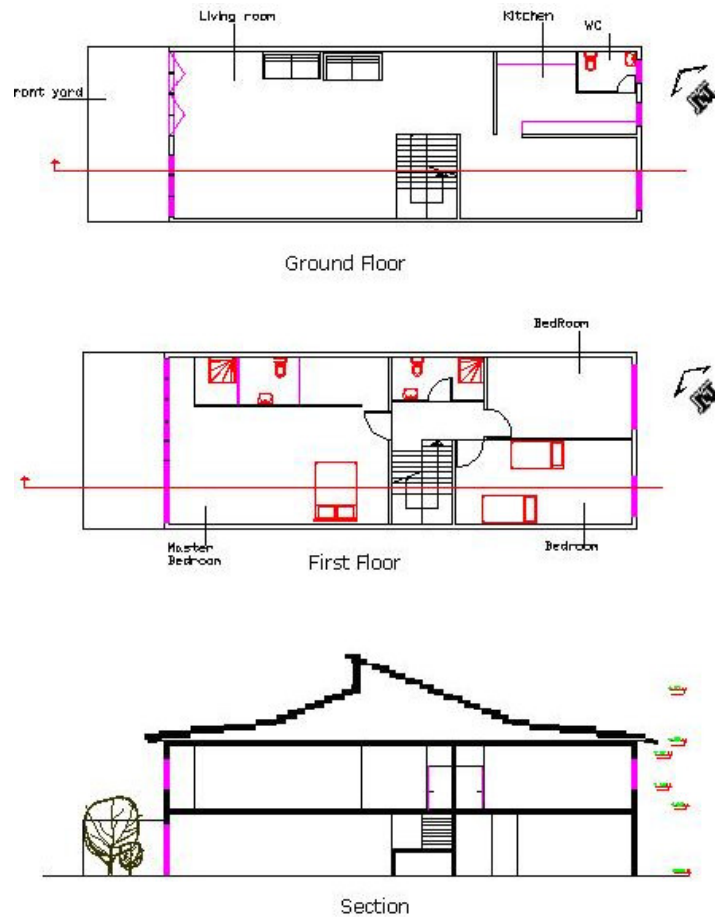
Floors plans and longitudinal section of the case study terrace house.
